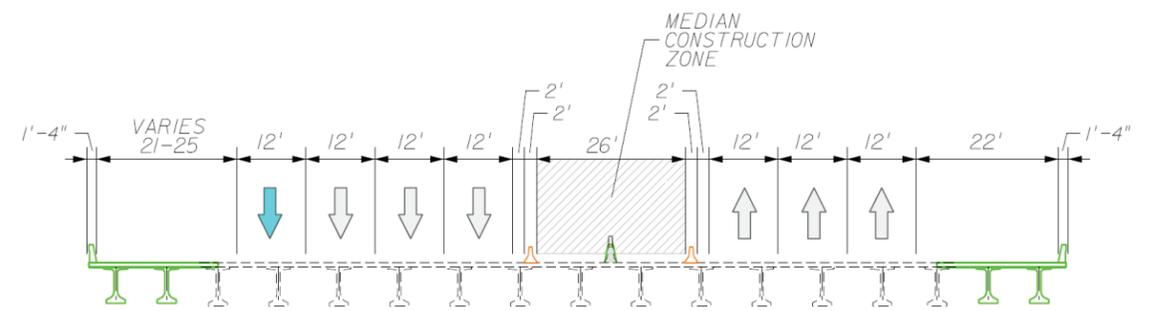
Bridge Over SW 56th Street/Miller Drive - Median Reconstruction
